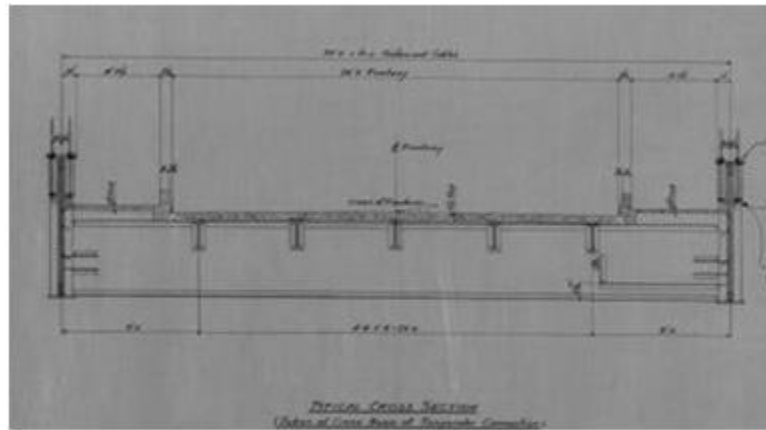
a Typical section through bridge deck (The Tacoma Narrows Bridge Blueprints, 2016)
